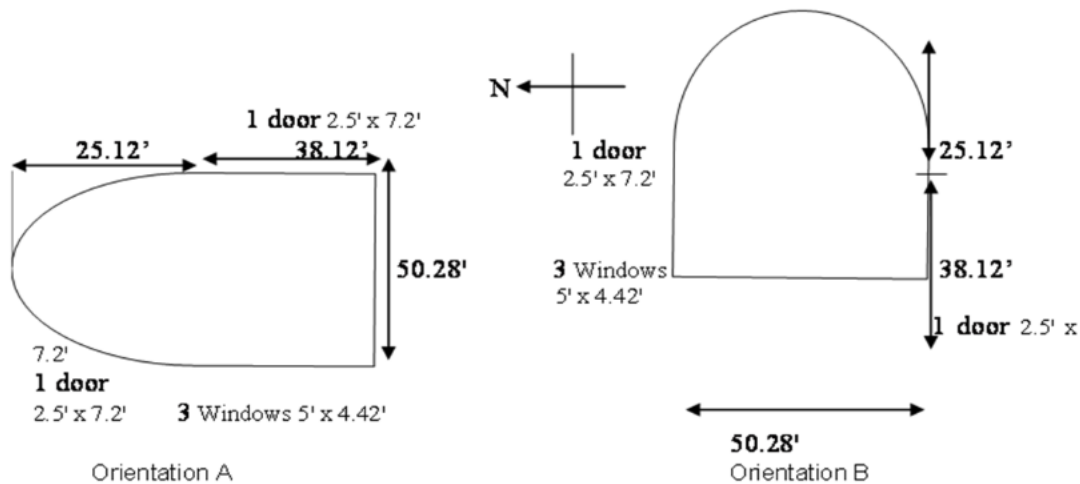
Plan View of a Senate Building at University of Ibadan, Ibadan, Nigeria.
